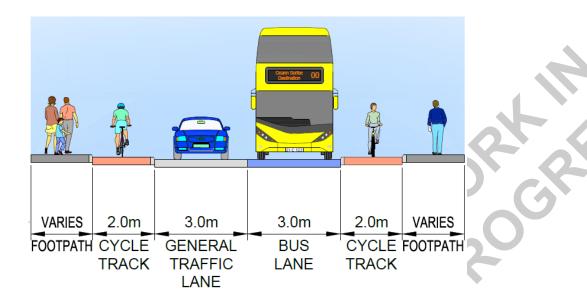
Section 2, Proposed Option 1 - Cross Section A-A
